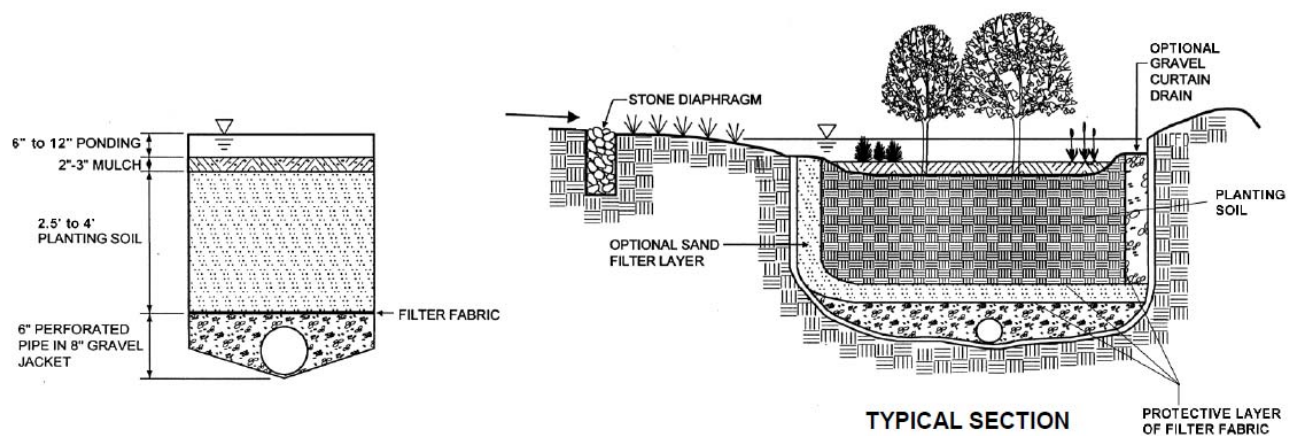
Cross Section View of Typical Bioretention Facility (Source: Maryland Stormwater Manual)
